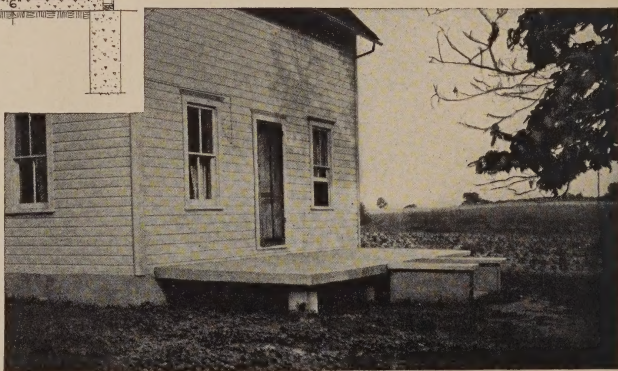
At right: Self-supporting porch floor. This type of concrete slab is reinforced so as to be self-supporting, as shown. If properly constructed, this type of floor is proof against cracking.
